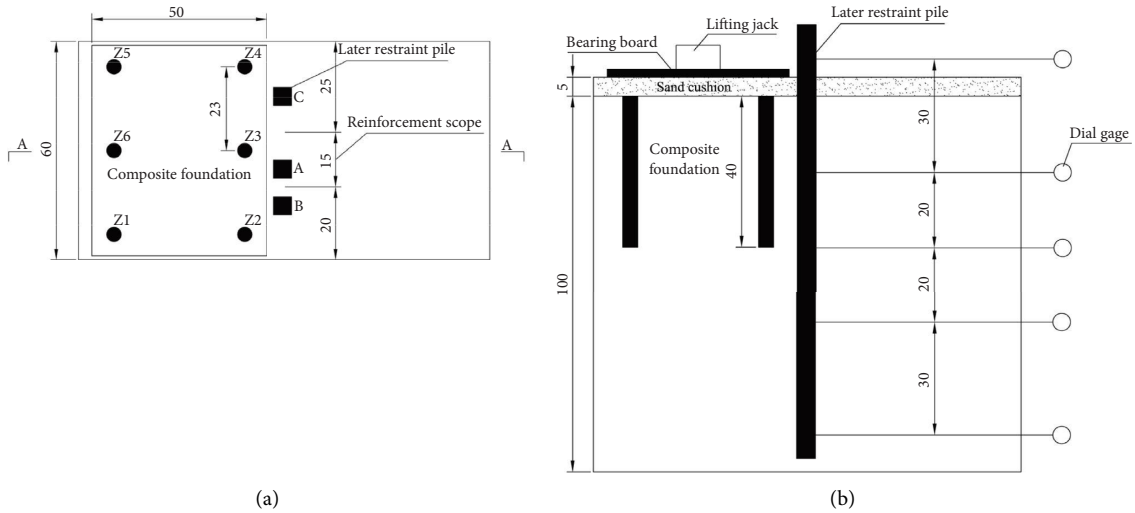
Arrangements of the test. (a) Design of layout plan (unit: cm). (b) Sectional drawing of “A-A” (unit: cm).
